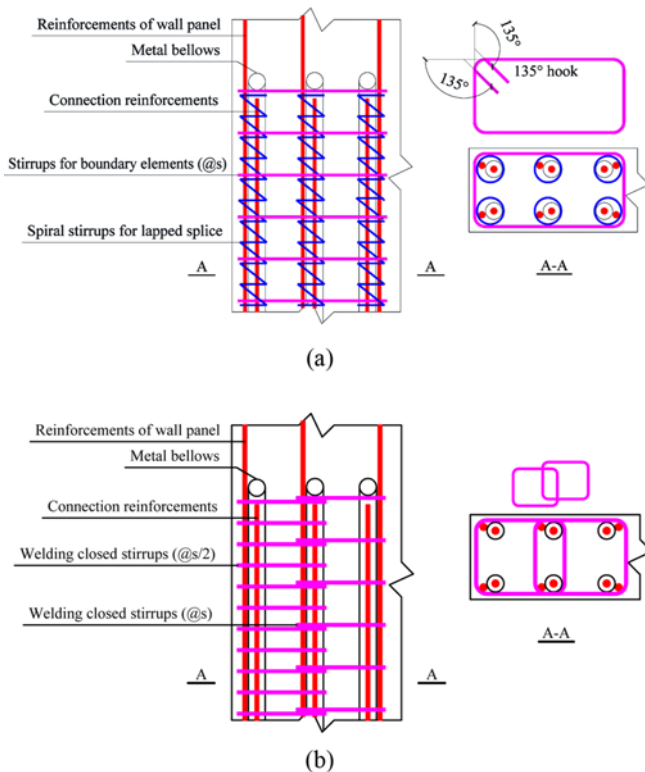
Proposed Transverse Reinforcement detailing for Boundary Elements: (a) Local Constraints by Spiral Stirrups, (b) Overall Constraints by Lapped Welding Closed Stirrups
